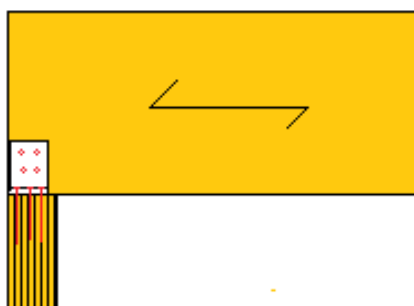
Beam-to-beam on-top connection with angle brackets (Source: Kovanen, H. 2014)
